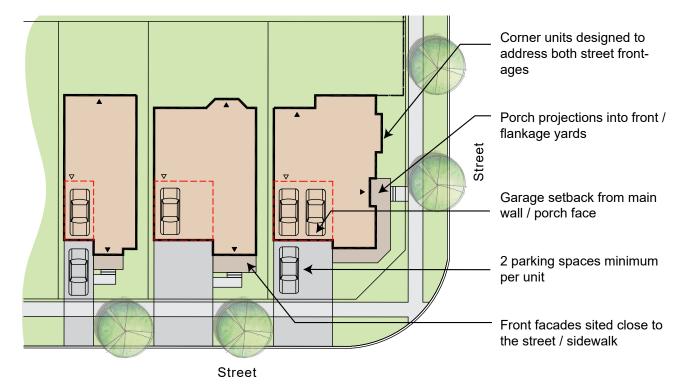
Conceptual Demonstration Site Plan For Detached Dwellings
